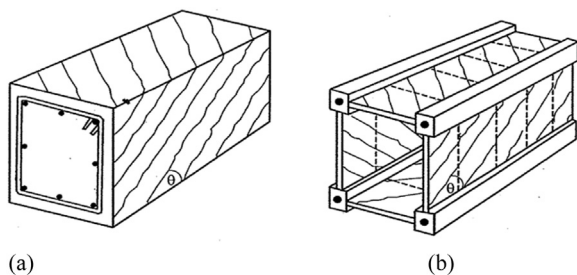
The idealized cross section for torsion (a) Section of the actual beam (b) Truss model ideal section [29].
